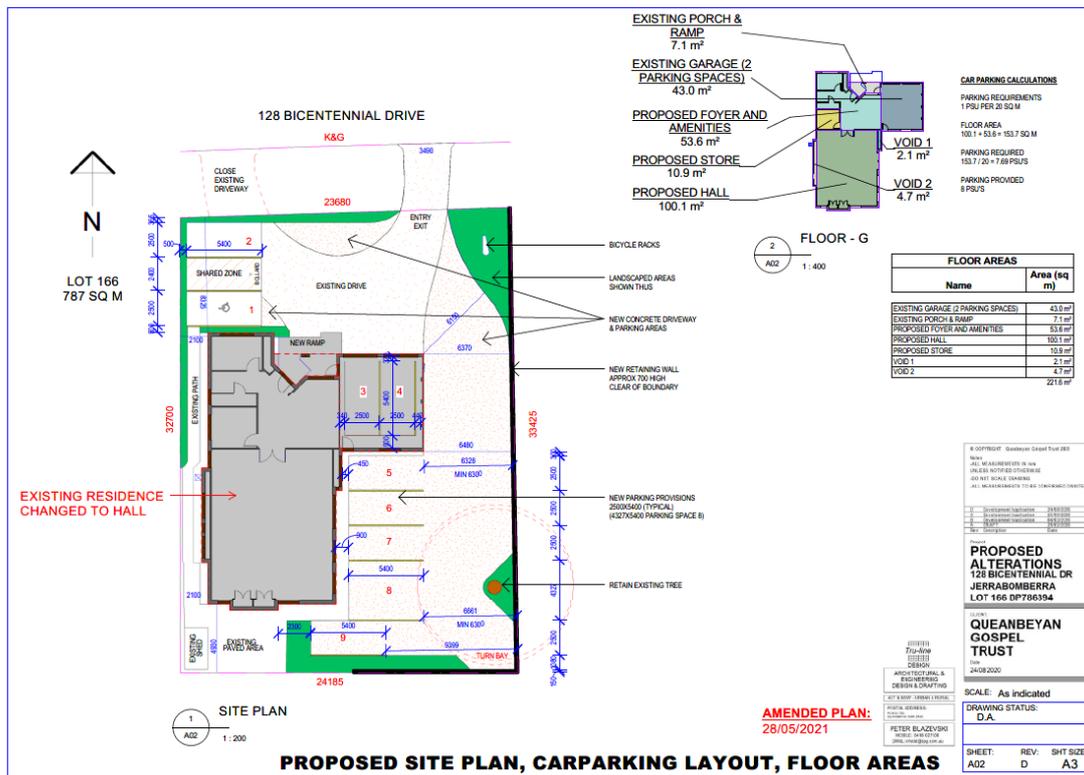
Original Site Plan Proposal Under DA.2020.1109 (prepared by Tru-Line Design)
